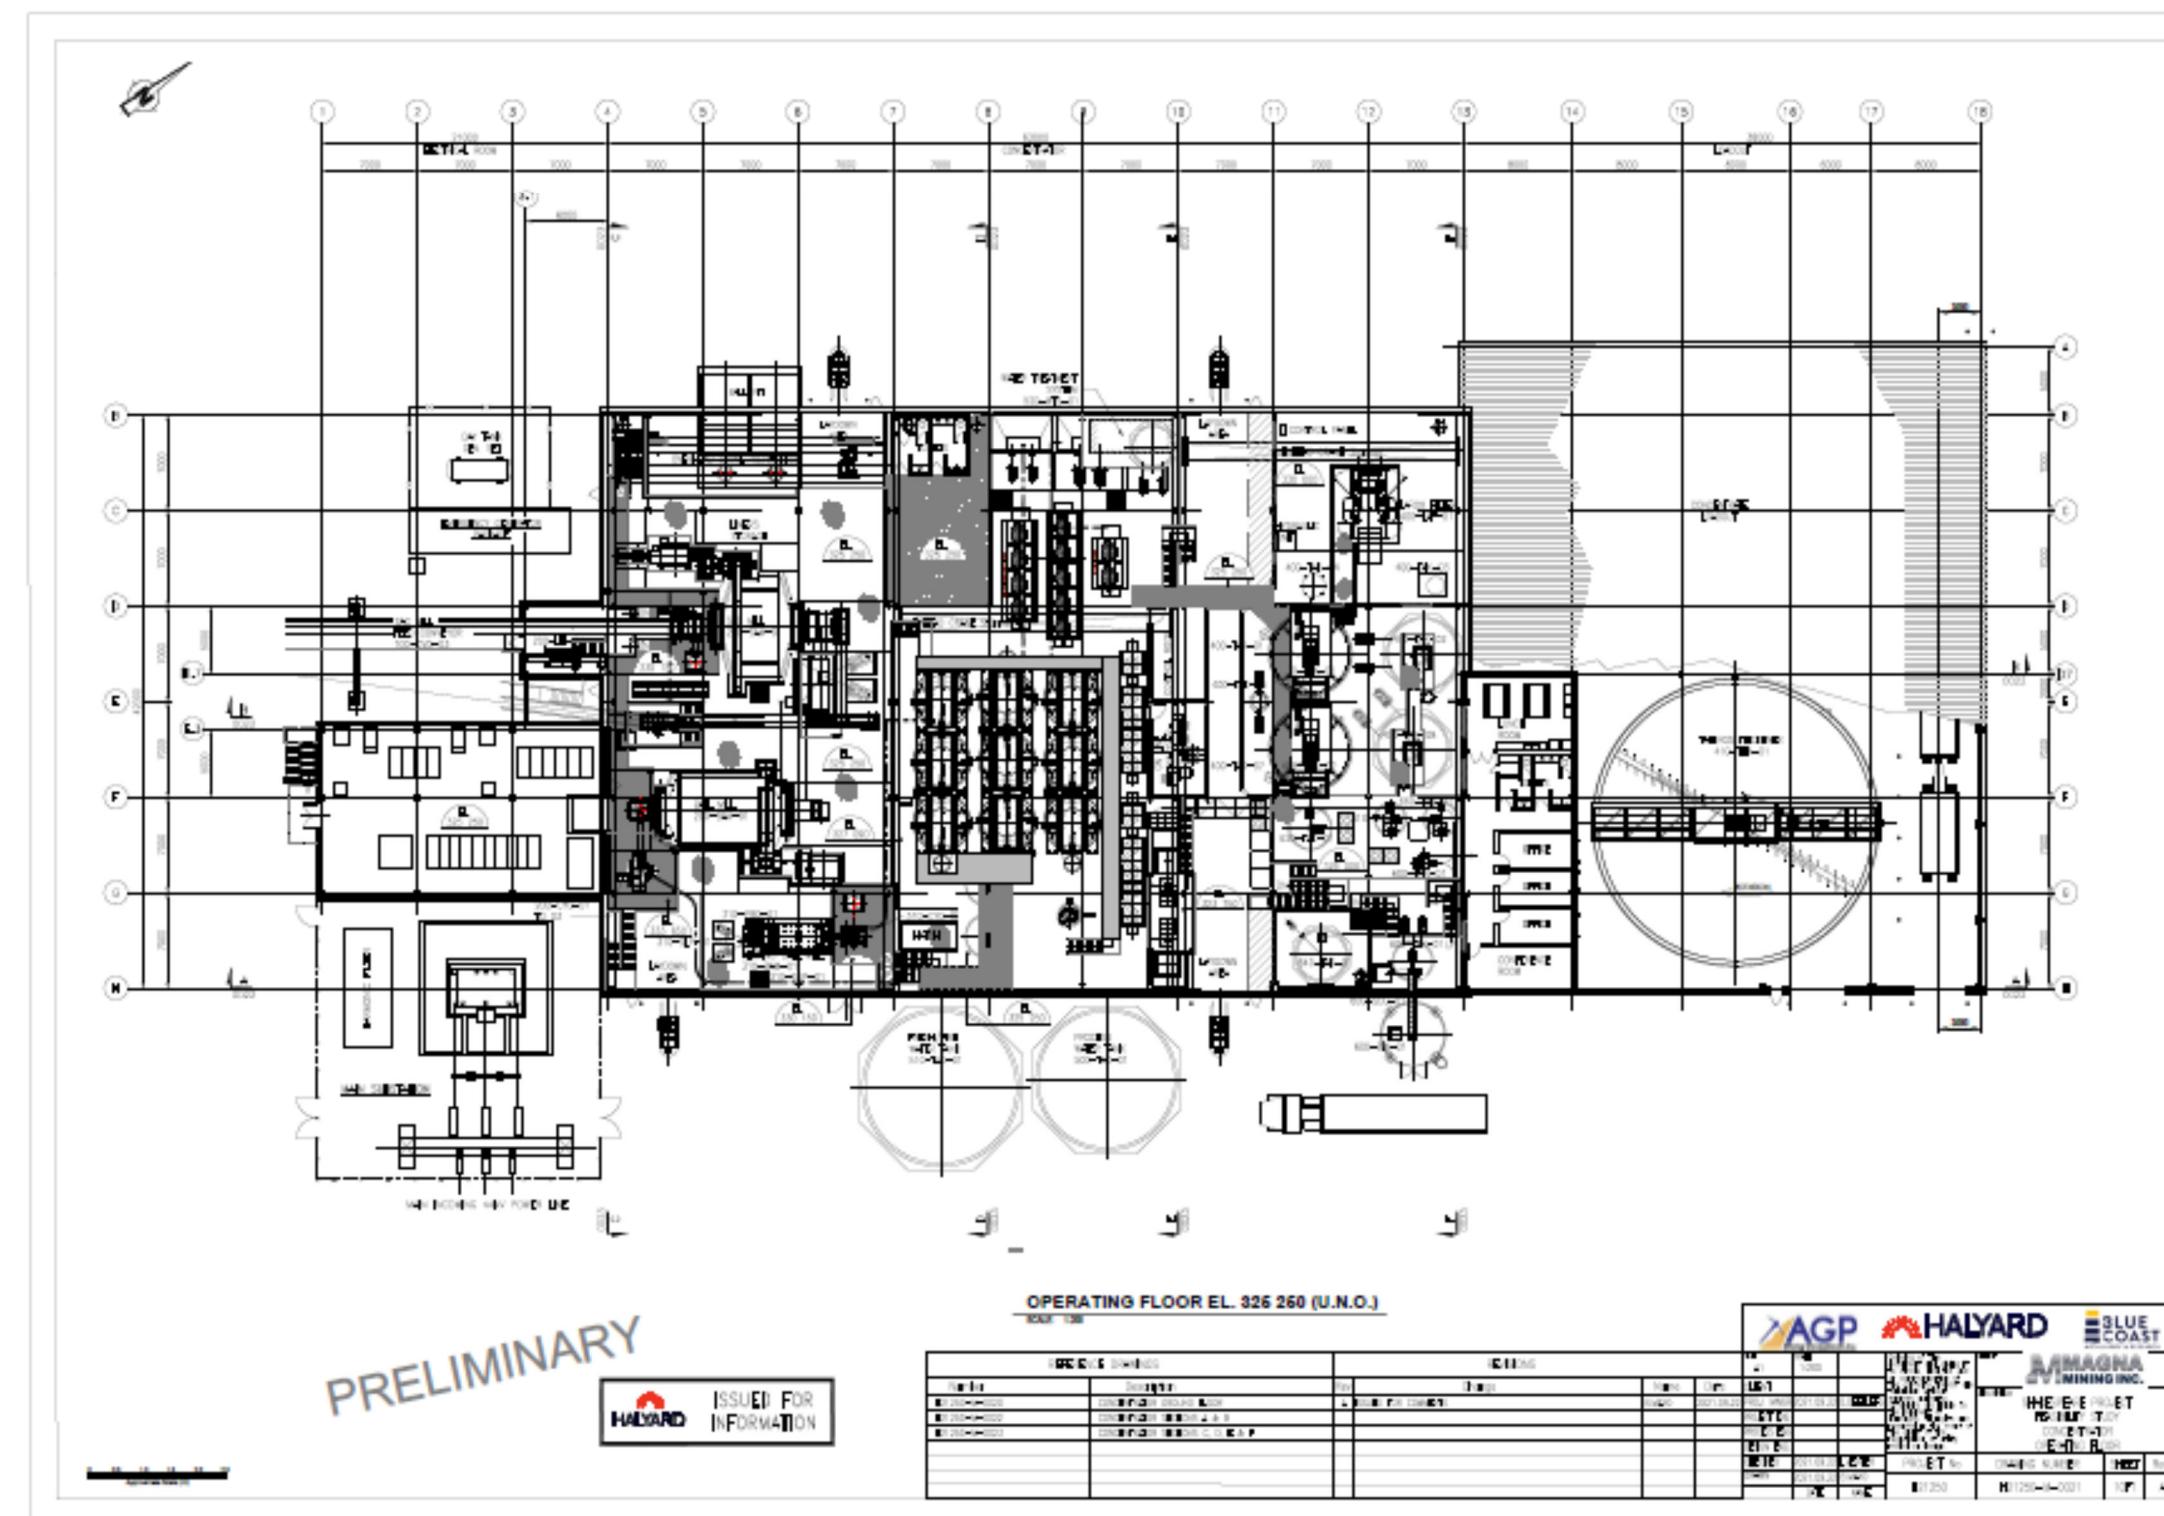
Operating Floor Plan View for the Shakespeare Processing Plant
